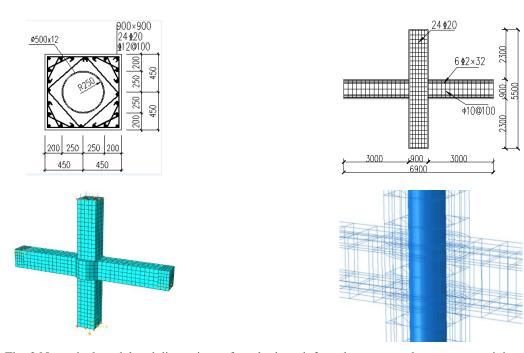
Numerical model and dimensions of steel tube-reinforced concrete column structure joints
